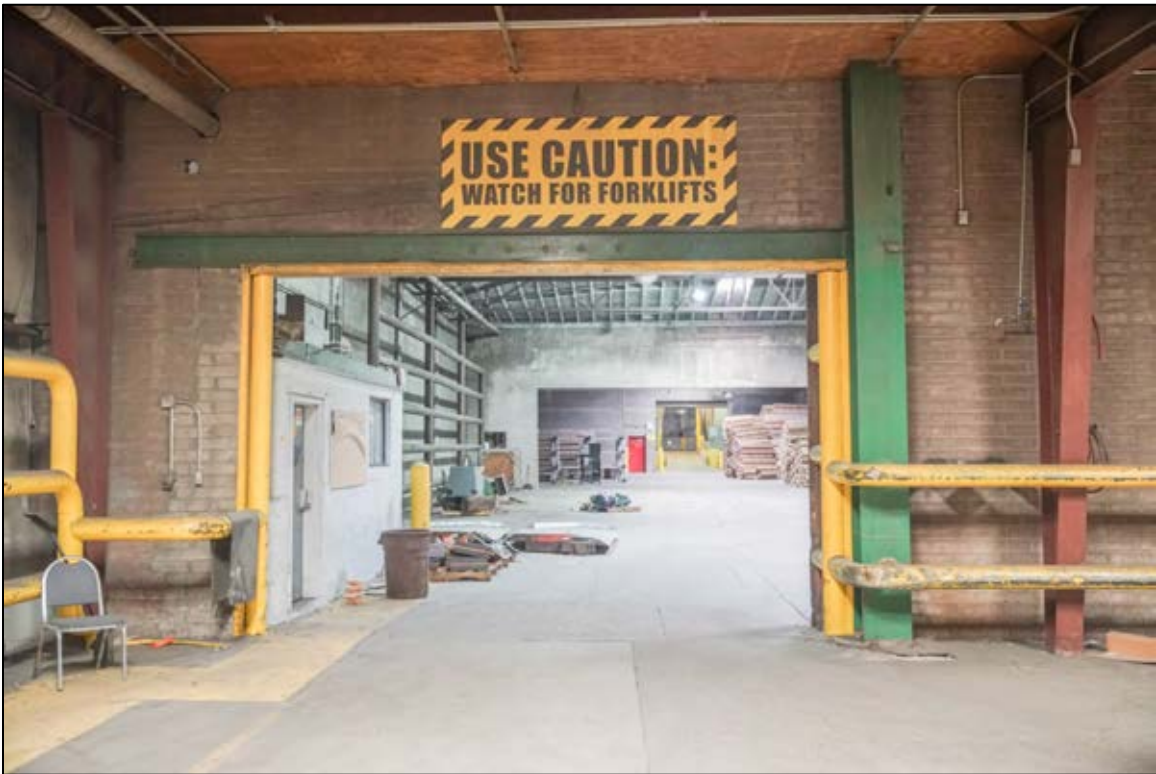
Photo of Building 1 interior, from truck bay, facing west-southwest.
